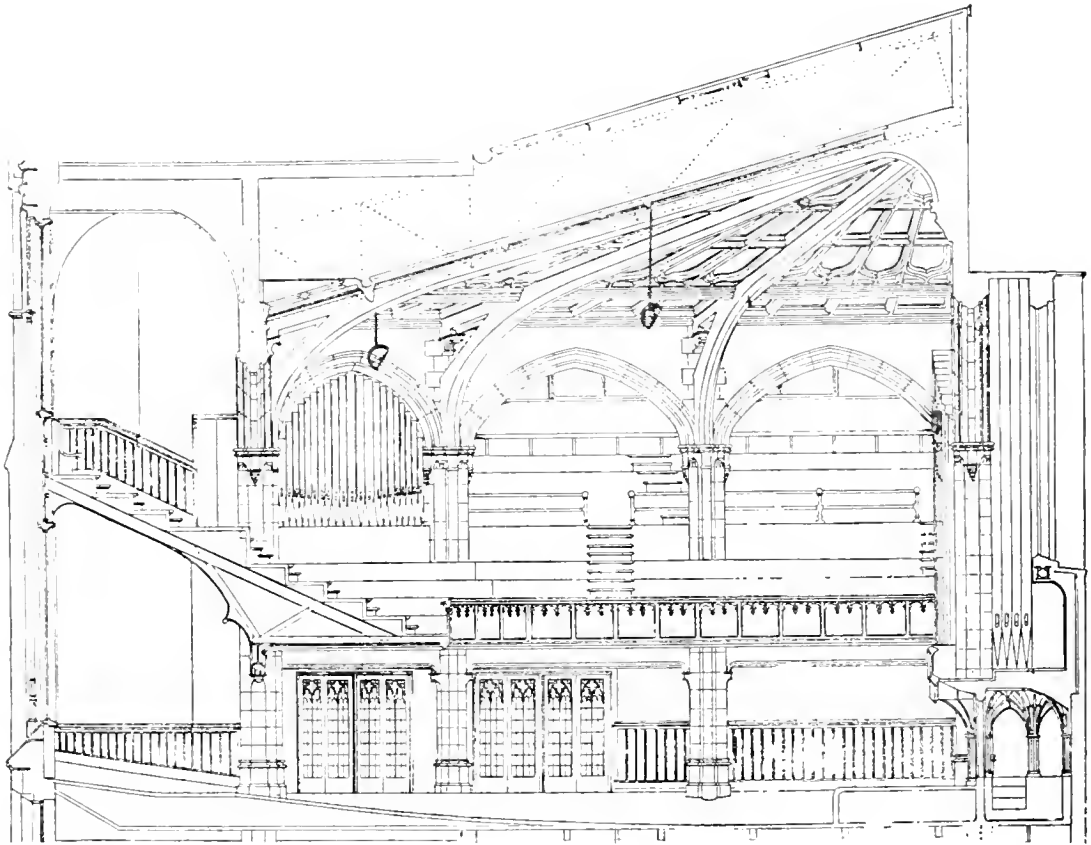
Sectional Elevation of a Church having an Inclined Floor and Ceiling Suspended Lighting Units
